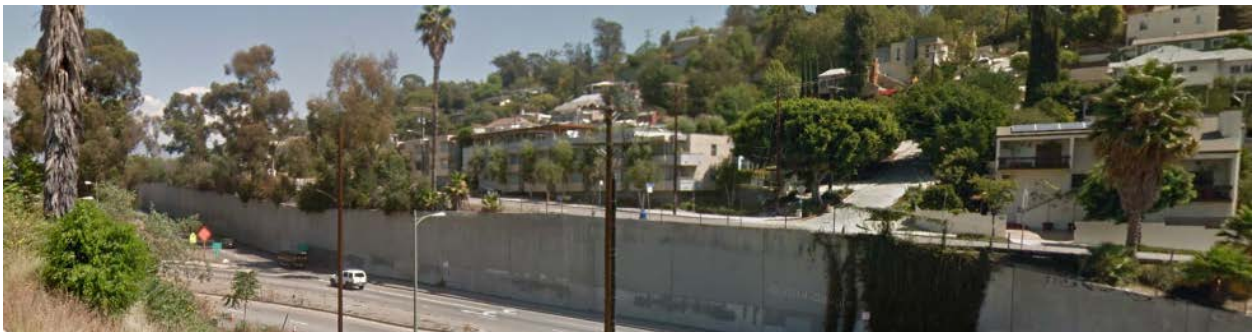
View of site of rejected proposed noise barrier atop retaining wall, Route 2 south of I-5, Los Angeles, CA (image from www.google.com/maps).
